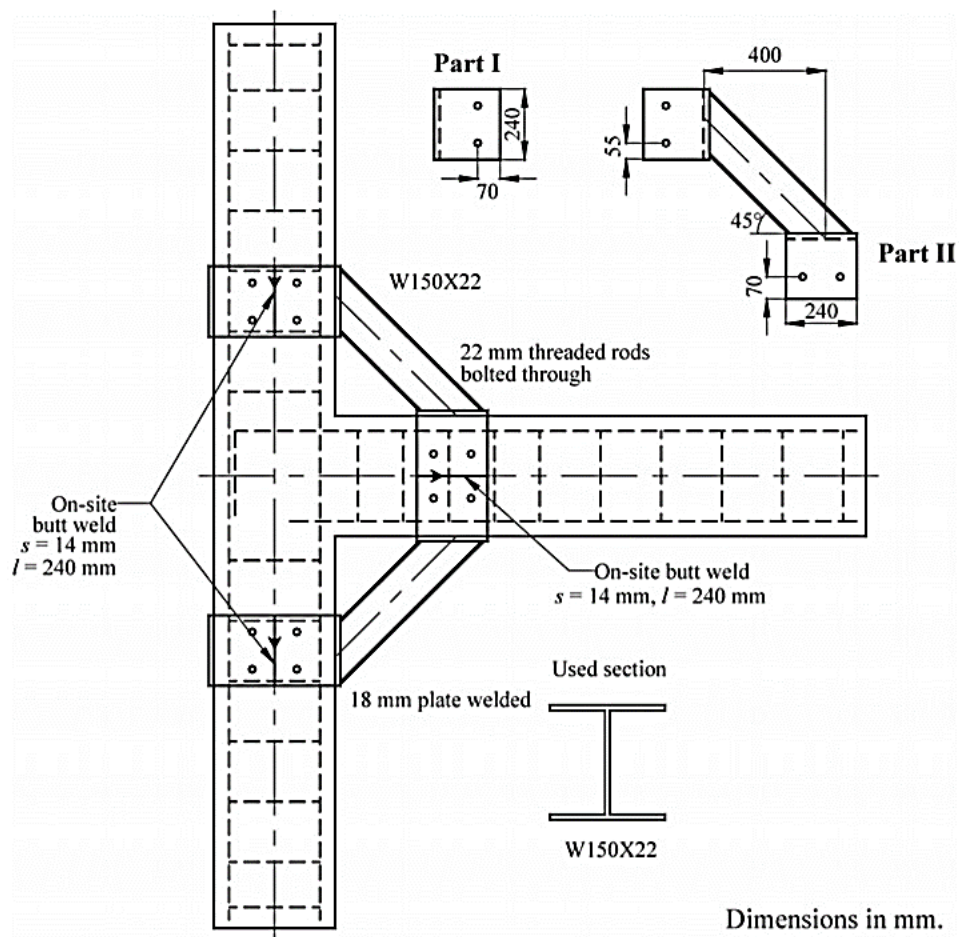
Local steel bracing retrofitting scheme (Said et al., 2008)
